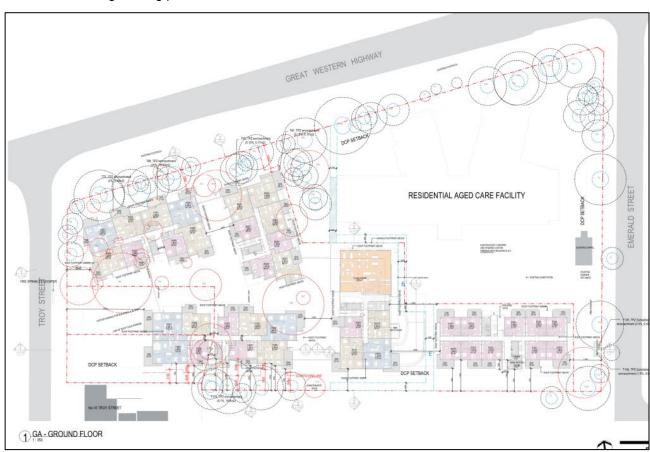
Architectural Ground Floor Plan (Source: Drawing A 2001 Rev H prepared by Group GSA dated 25/09/22)
